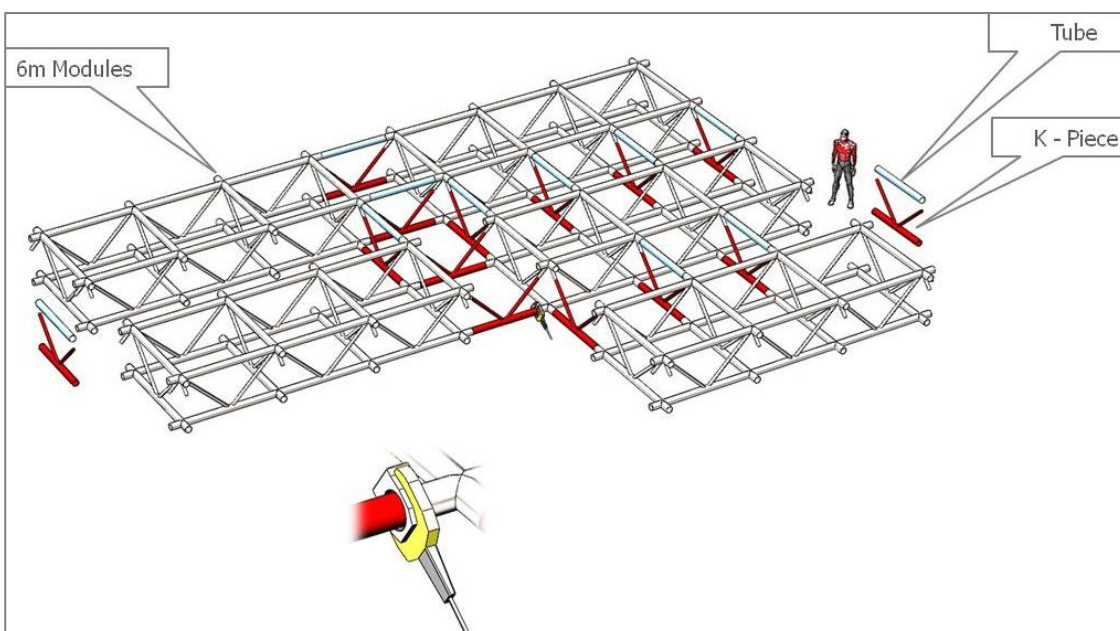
Proposed Use of Automatic Orbital Welding Equipment. Courtesy Technodyne Ltd
